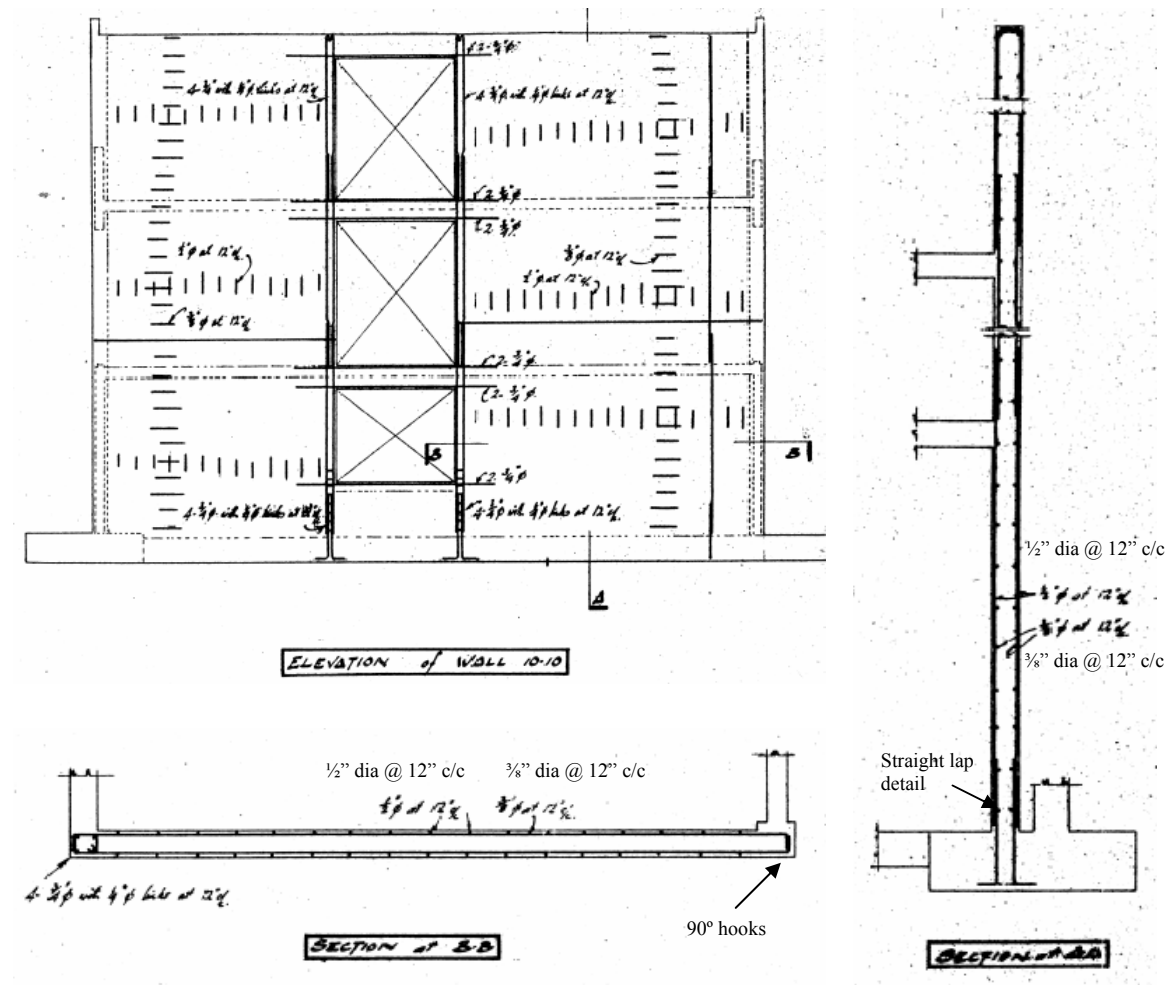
Wall reinforcing details, Whakatane Hospital (1961)
